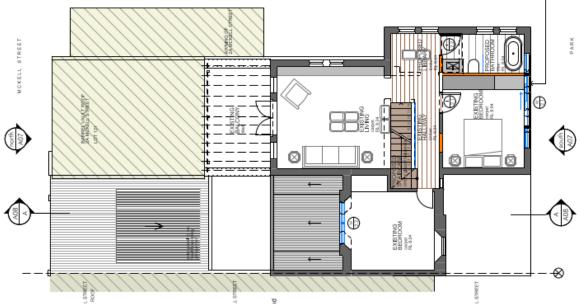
Proposed first floor with internal relocation of bathroom at 2 McKell Street.
